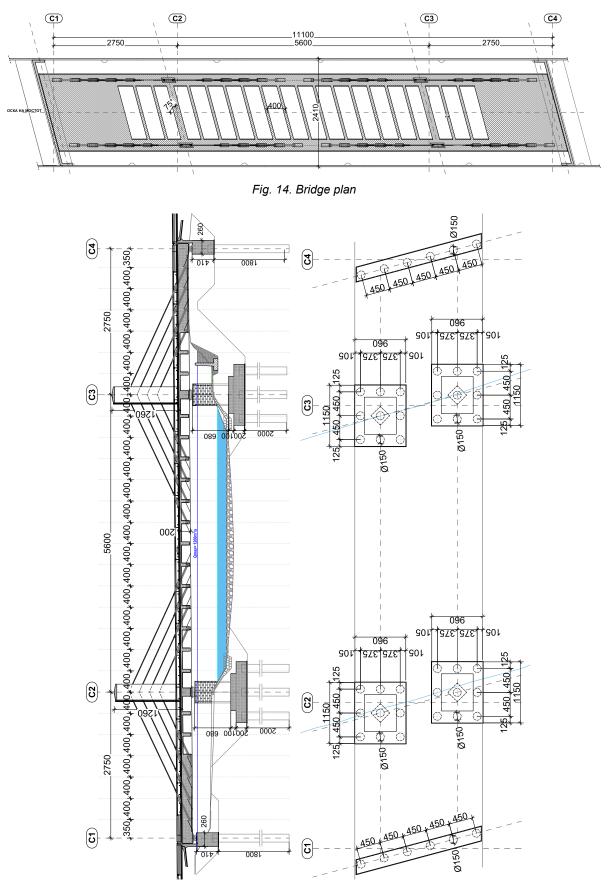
Longitudinal section of the bridge (left) and foundation plan (right)
